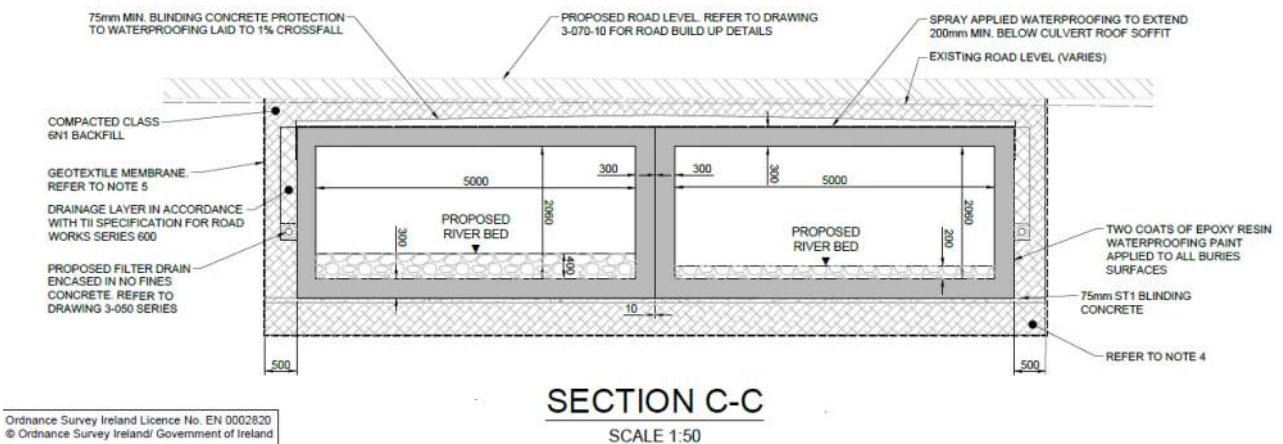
Brooklodge Grove Typical Culvert Section Indicating Low Flow Channel
